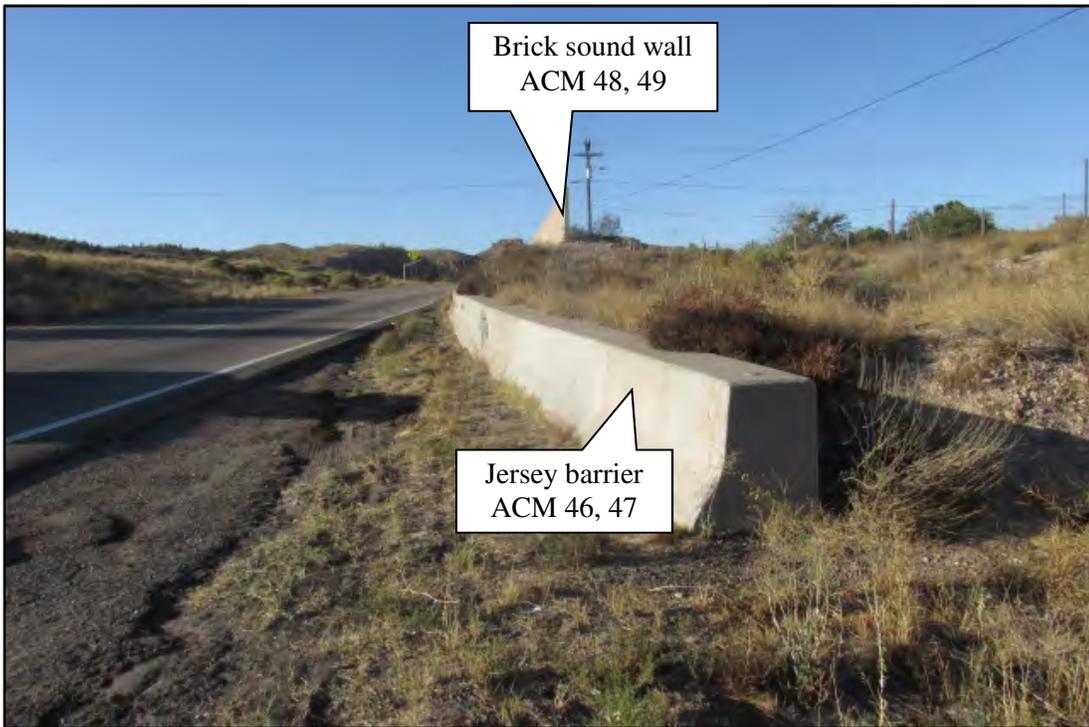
Detail view of the West Kingman TI WB on-ramp SWC RCMP.
